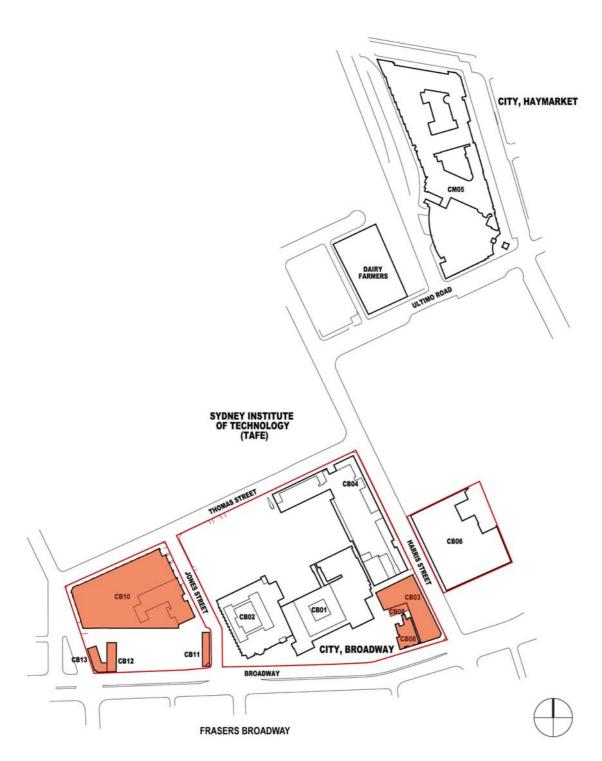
Site plan showing study area in outline. Buildings assessed for Stage 1—Built Heritage Assessment are shown shaded. (Source: UTS, with GML amendments)
